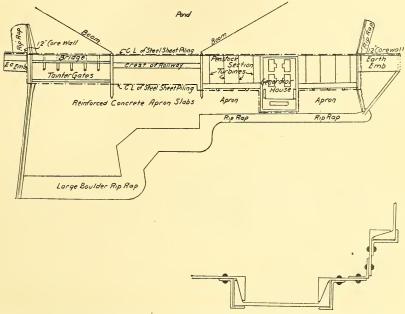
One of the many standard types of interlocking steel sheet piling, and its use in core wall of dam.
